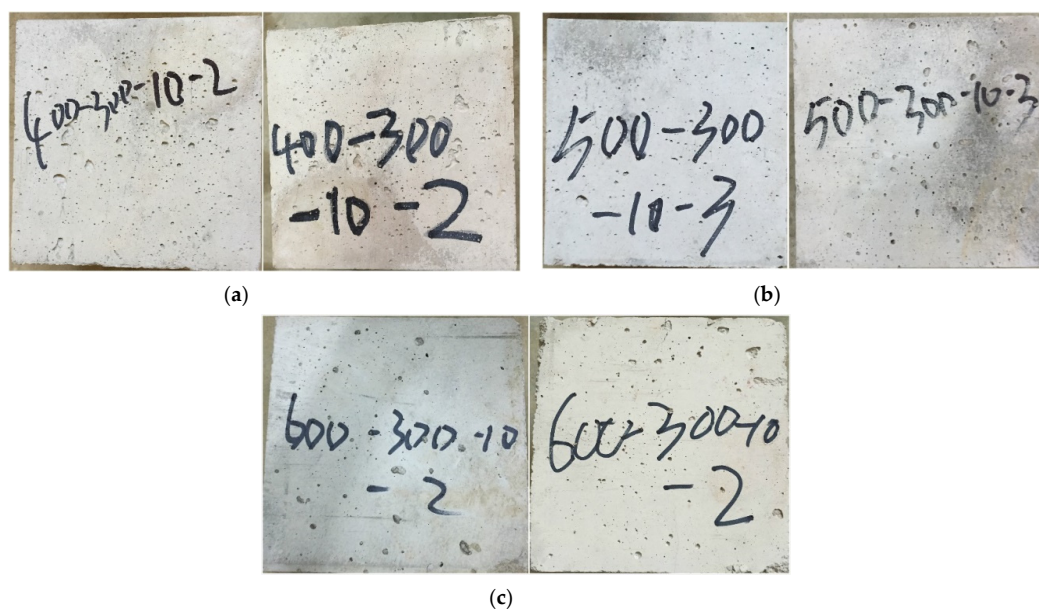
Concrete specimens subjected to 10 thermal cycles before (left) and after (right). (a) Test 400-300-10; (b) Test 500-300-10; (c) Test 600-300-10.
